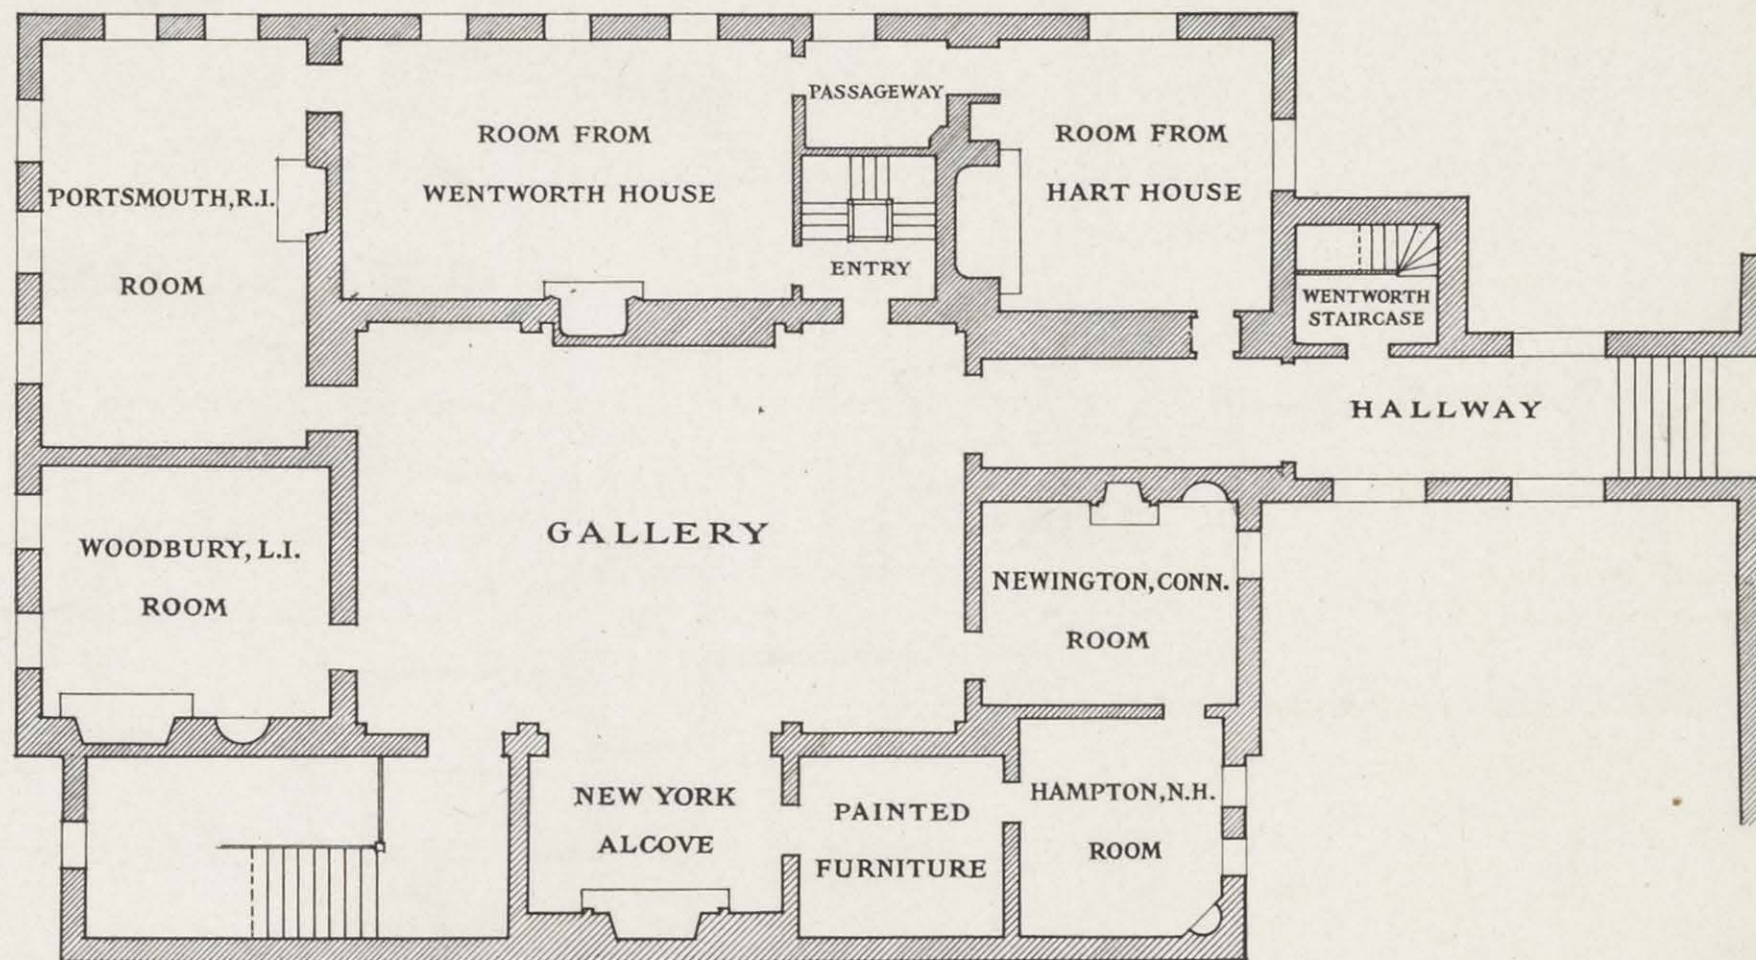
PLAN OF THE ROOMS OF THE THIRD FLOOR
